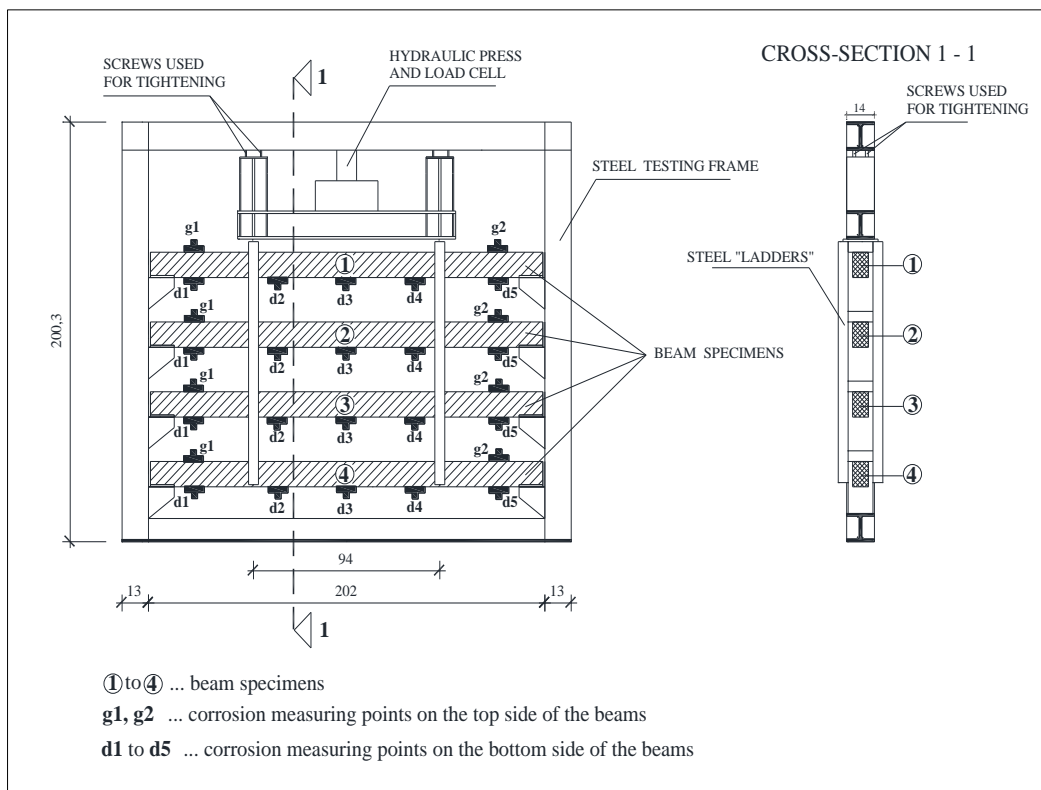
Experimental setup: four-point bending loading frame with beam specimens (dimensions in cm)
